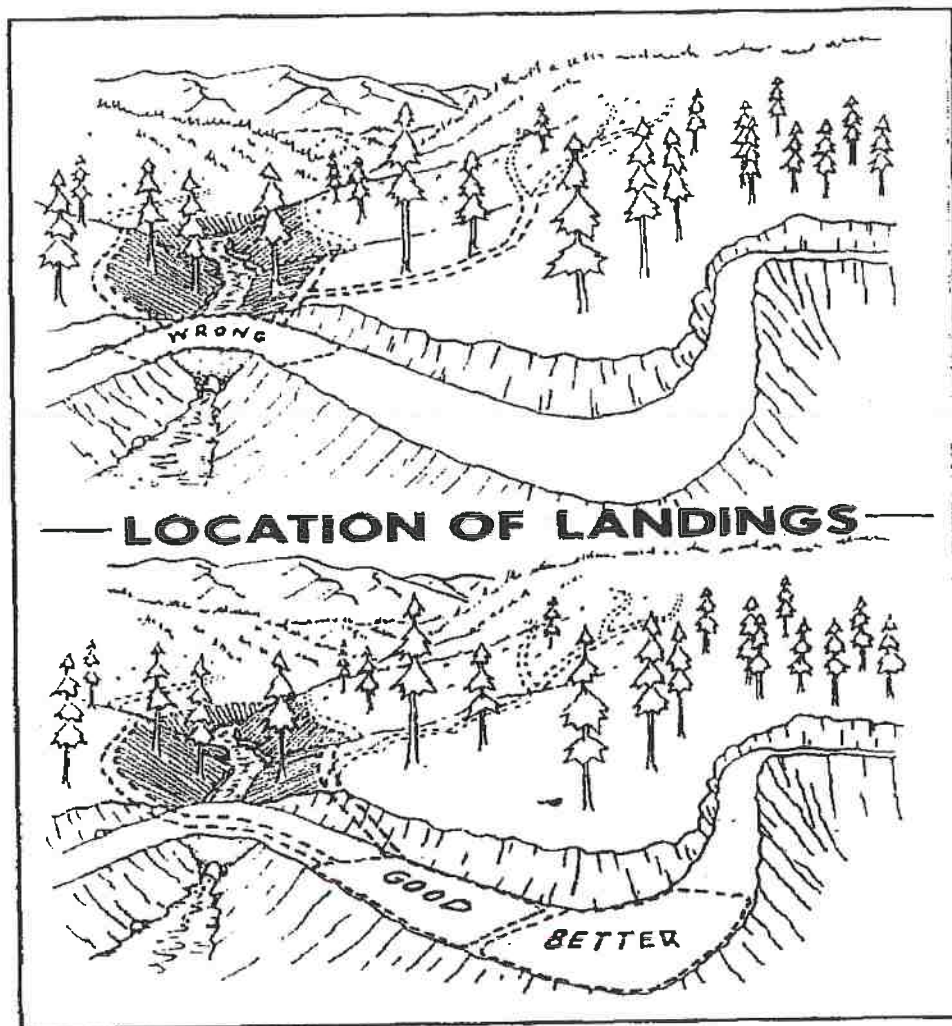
Log landings on forest road systems should be kept to the absolute minimum size necessary to accommodate yarding, loading and hauling equipment and the minimum number needed to remove timber resources. Landings constructed on gentle ground and broad ridge crests far removed from stream channels are least likely to cause water quality problems, whereas landings built on steep slopes and near watercourses can result in severe impacts. From Weaver and Hagans (1994). Adapted from (USFS, 1963).
